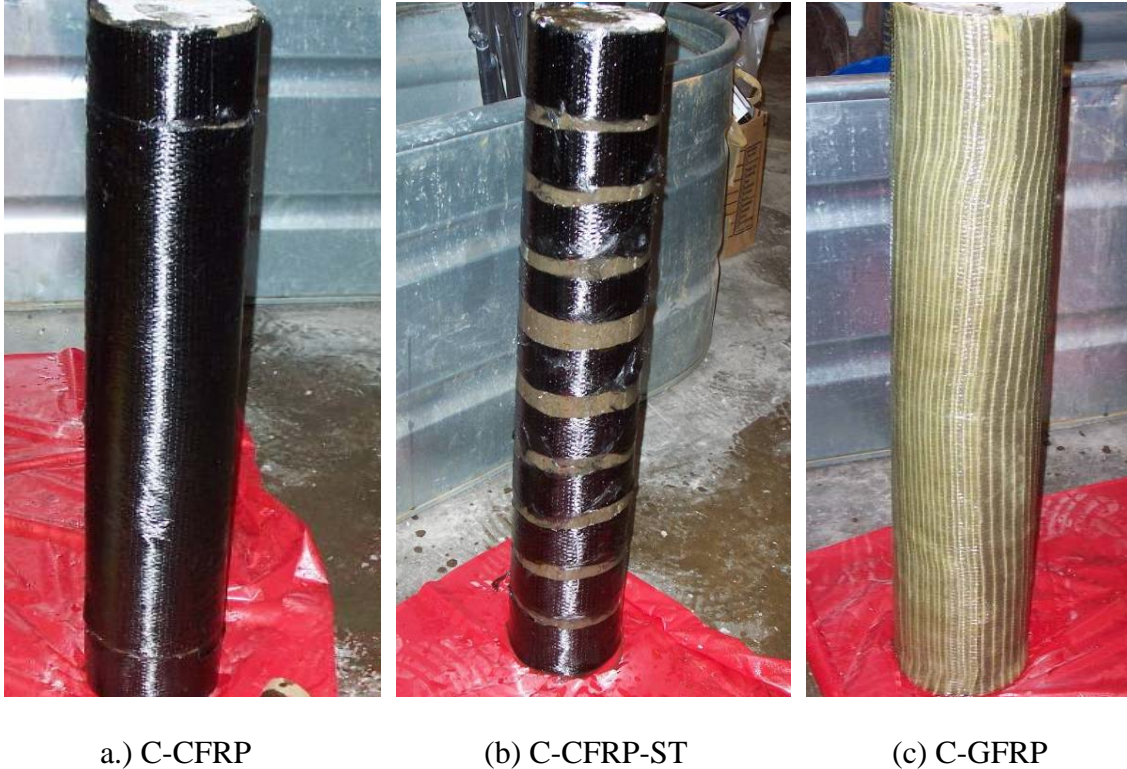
Reinforced Concrete Columns Retrofitted with FRP (Miller 2006).
